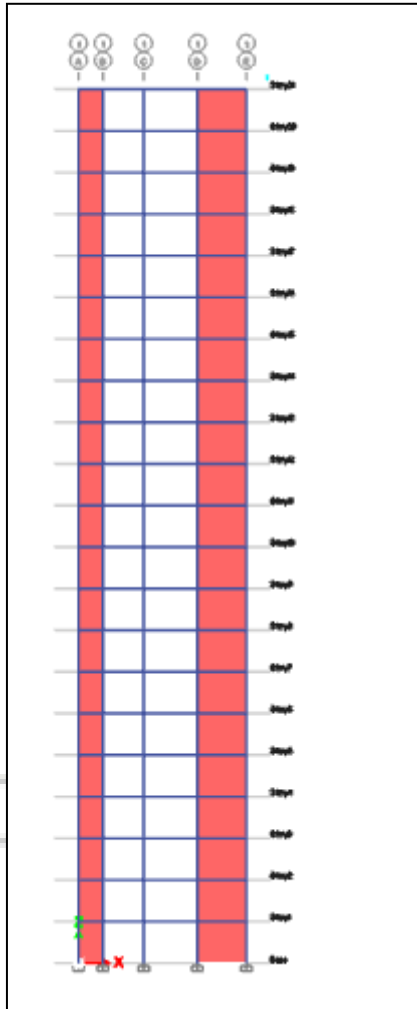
G+ 20 Residential Building Model Front Elevation with Shear Wall
